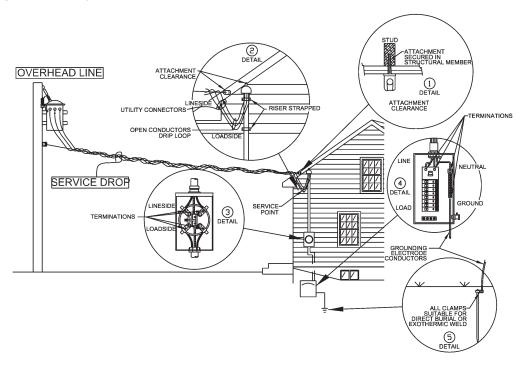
Typical Overhead Service Installation under 600V
